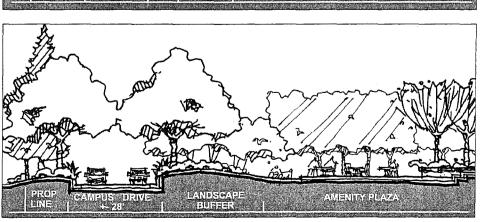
Section at Campus Drive East Entry at Arques Avenue
